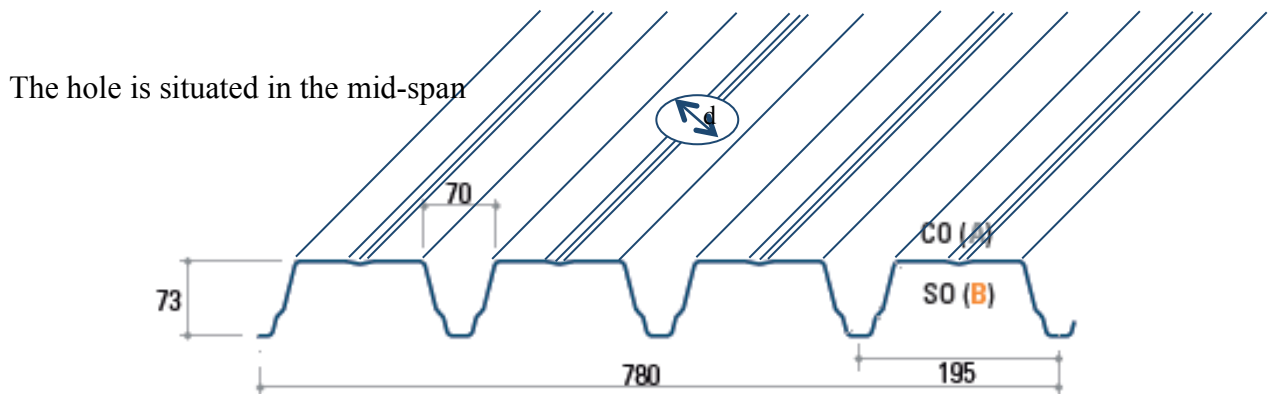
Sheeting PML 73 SE with circular hole - general view
